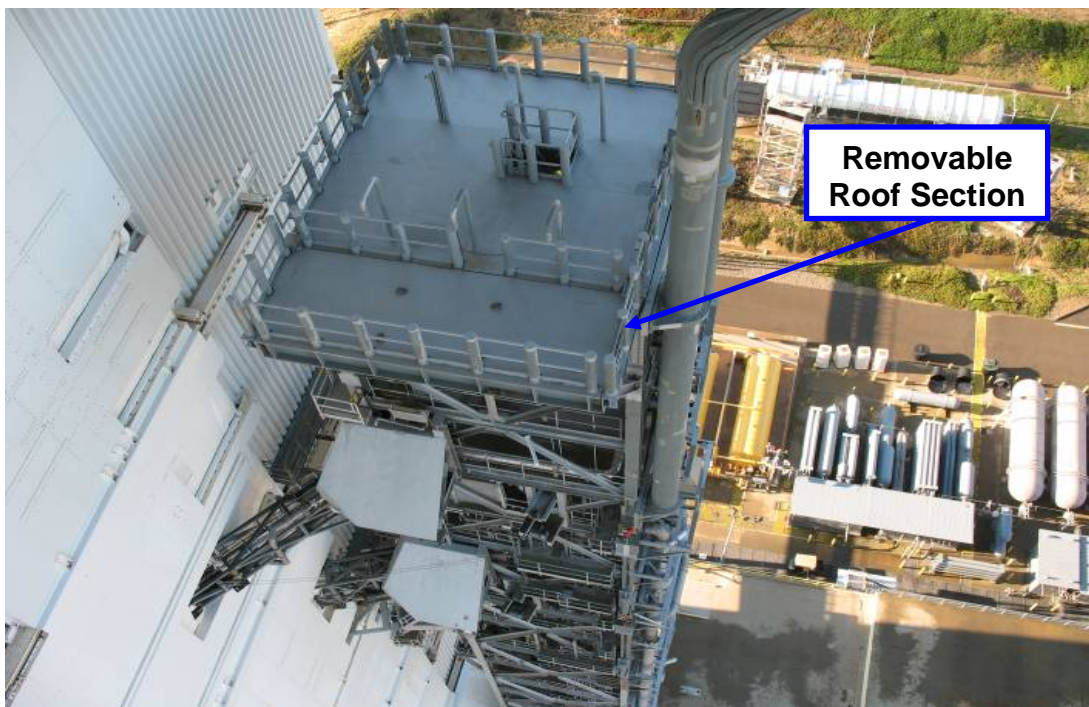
Fixed Umbilical Tower Roof on SLC-3
